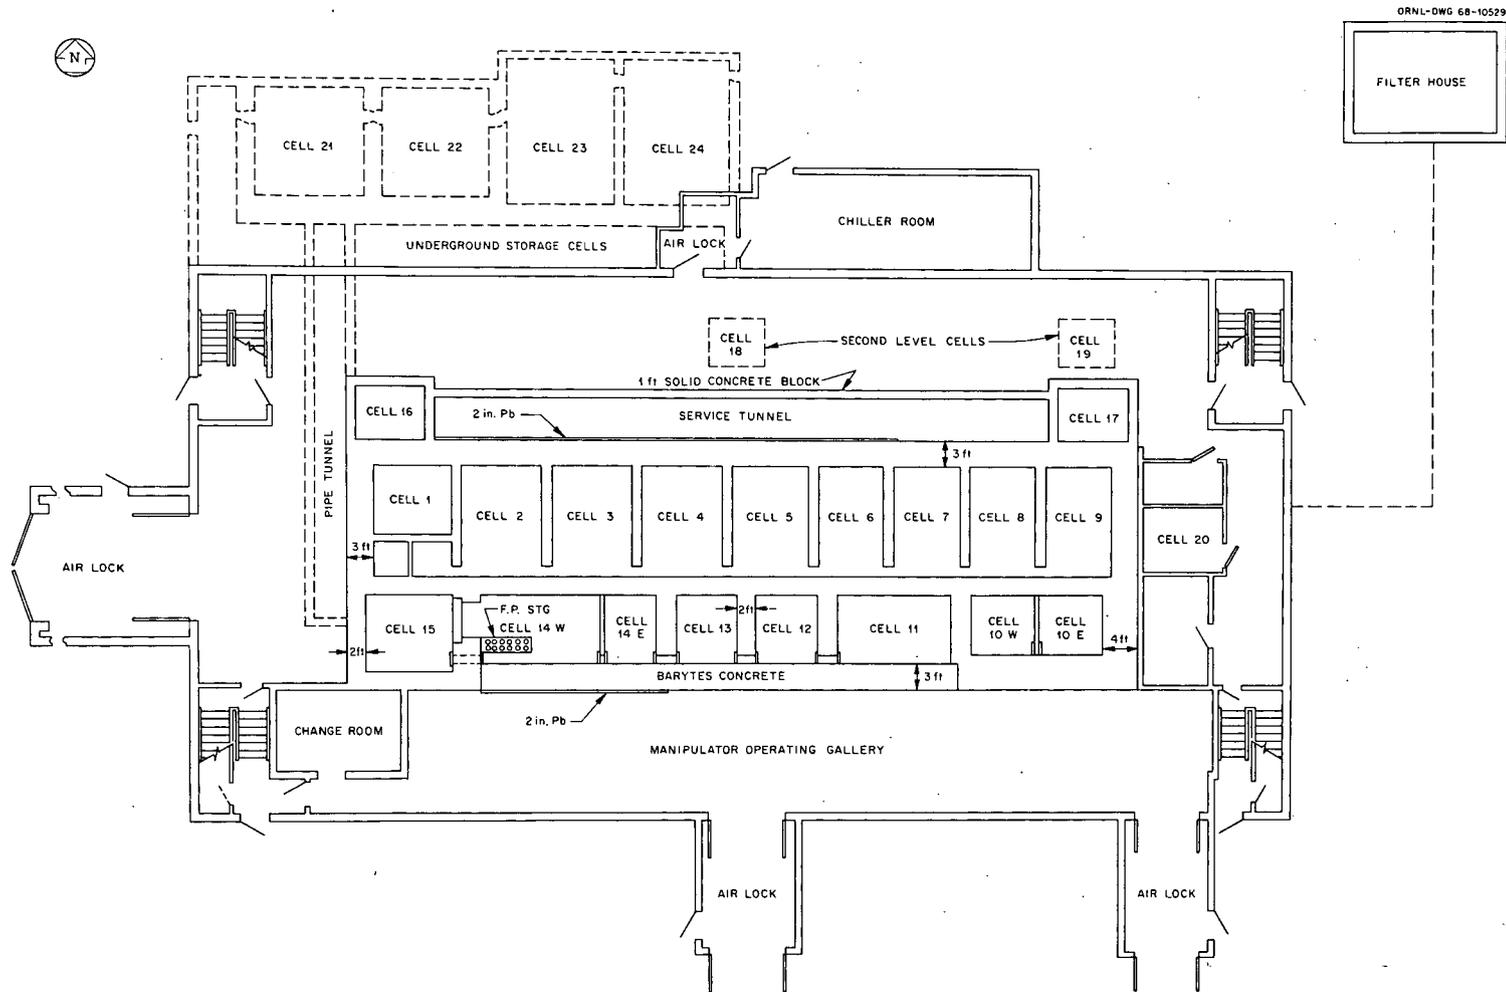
Fission Product Development Laboratory, first floor plan.
